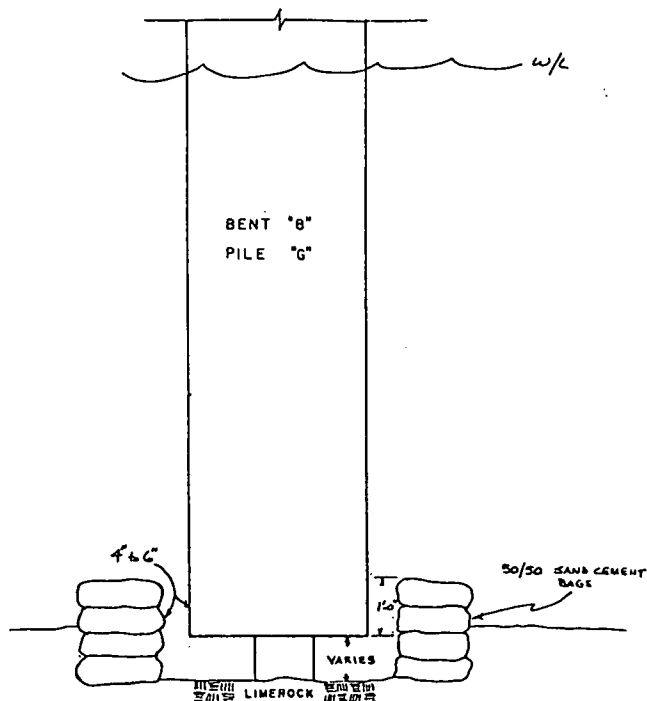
Scour repair of jacketed piles using sand-cement bags. (From Mississippi DOT plan).
